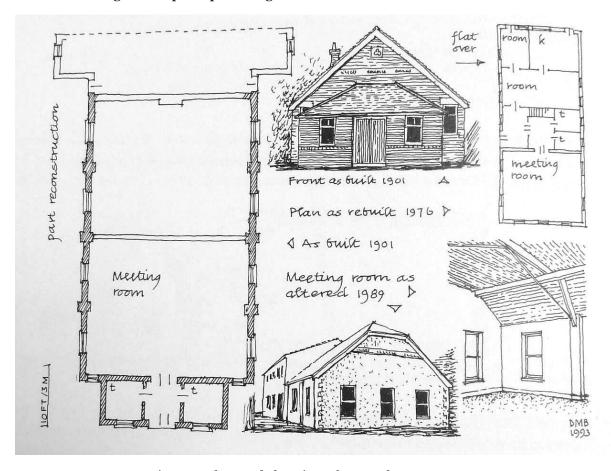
Plans and elevations, from Butler, 1999, p. 688
